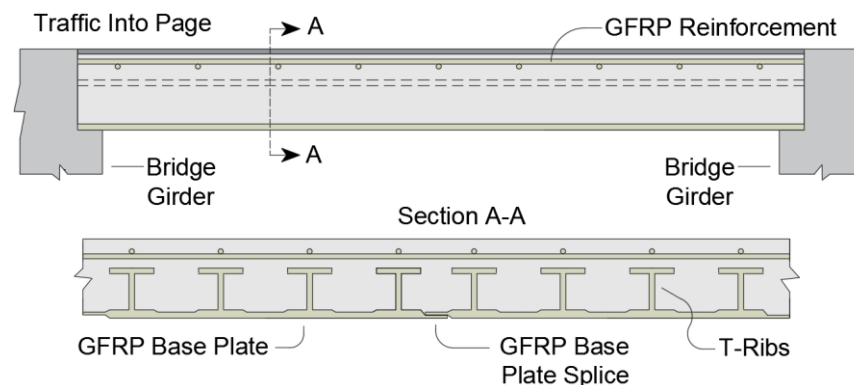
Typical configuration of GFRP stay-in-place T-up formwork.
